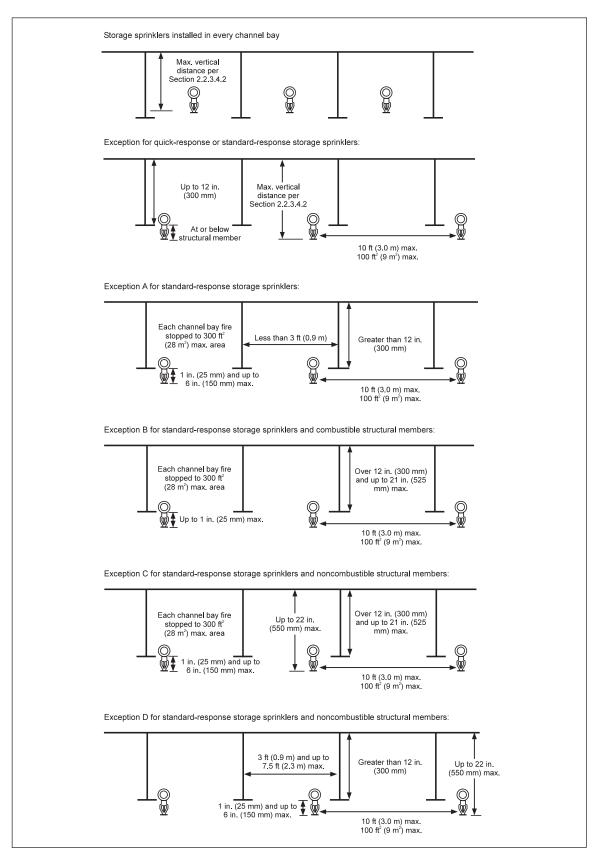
Location of Storage Sprinklers Under Obstructed Ceiling Construction
